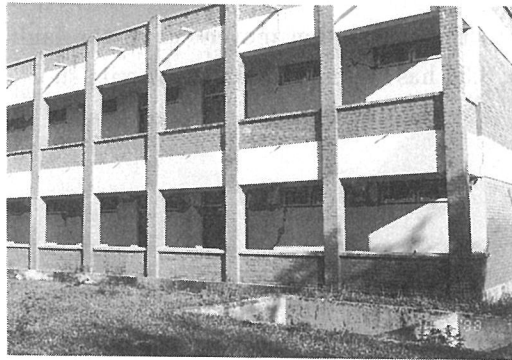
Shear failures in the short-span brick masonry wall of a special classroom, the Engineering College Campus, Tribhuvan University, Dharan Bazaar, Nepal
